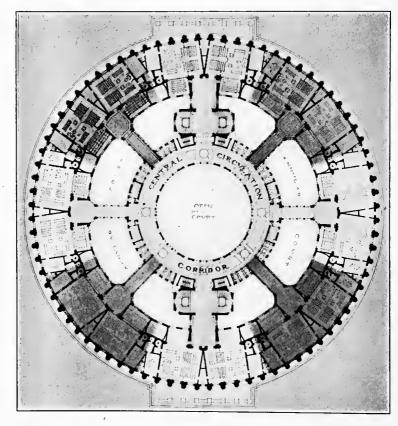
Architects' typical court room plan, No. 3, new County Court House, New York City, showing by shading the grouping of court rooms into separate units.
